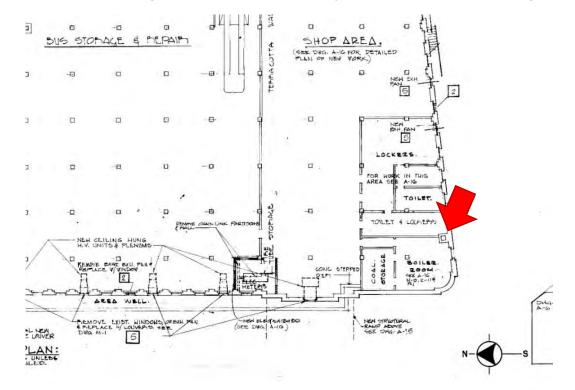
1978 Renovation drawing; red arrow shows the smokestack adjacent to the boiler room and coal storage (WMATA)
